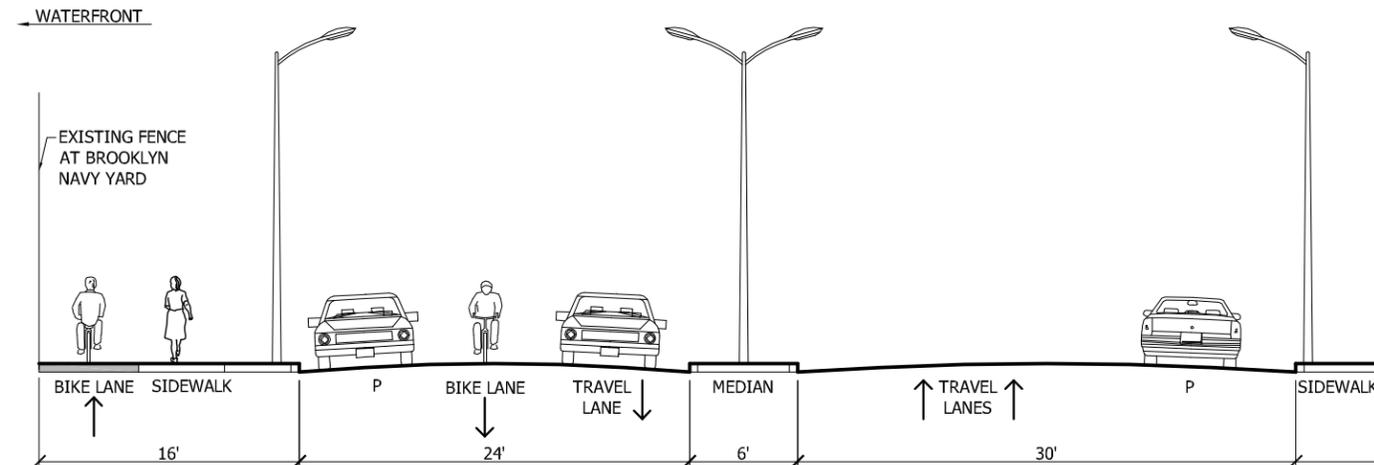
Existing configuration on Kent Avenue South at Navy Yard
